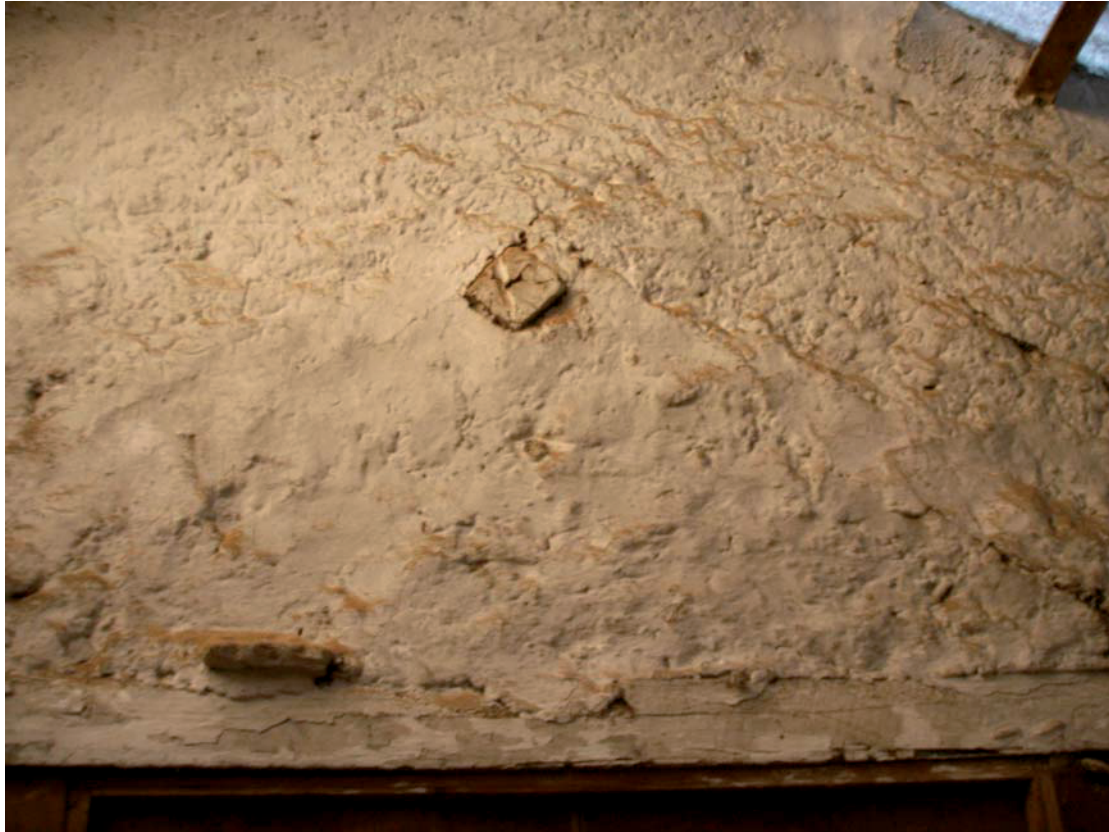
First floor of Workshop 2, above doorway into Workshop 1, showing roof scar
